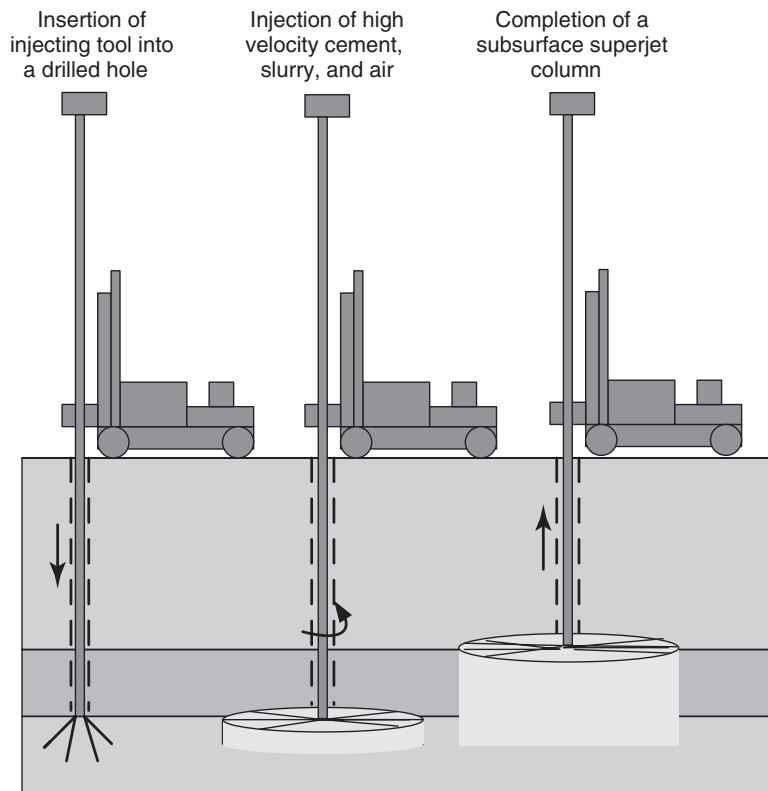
Jet grouting (After Hayward Baker, Inc.).
